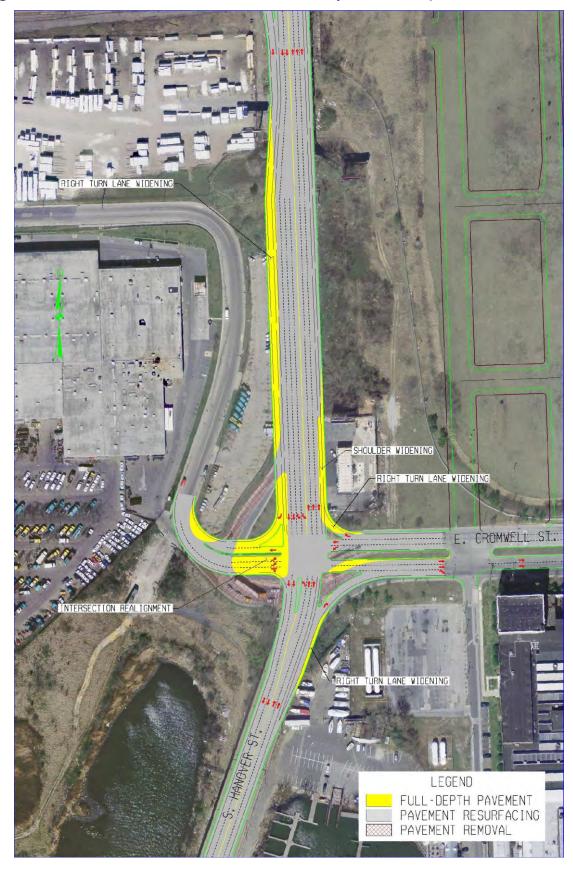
Hanover Street at Cromwell Street Improvements (Right-In, Right-Out) and New Roadway Between West Covington and Port Covington Underneath Hanover Street (To Connect To Future Development)
